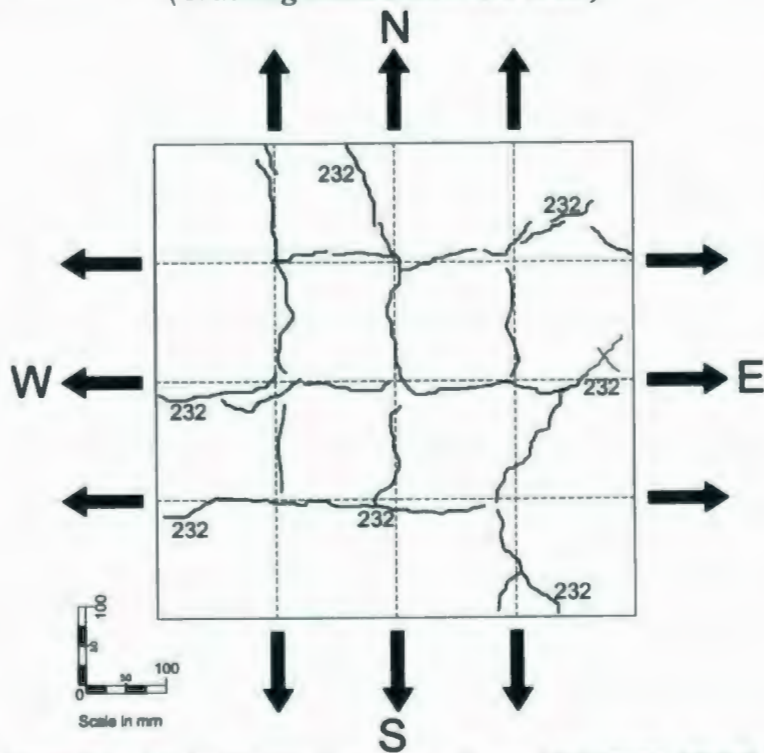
Stabilized crack pattern of panel P6-GHB-16-1.0-2.5
